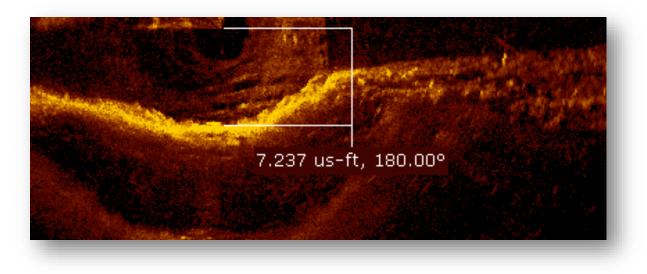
East Abutment, Left Face Minor Scour Sector Scan
